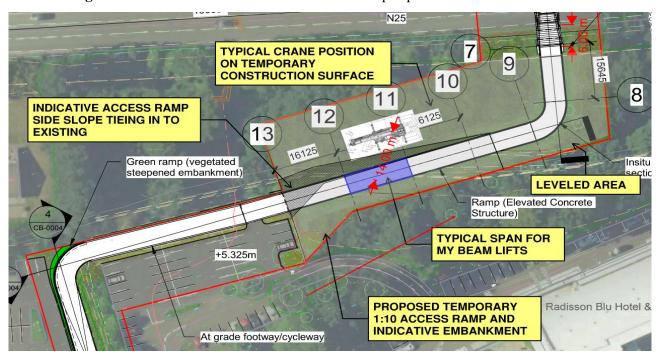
Proposed methodology for erection of southern elevated ramp precast concrete bridge beams
